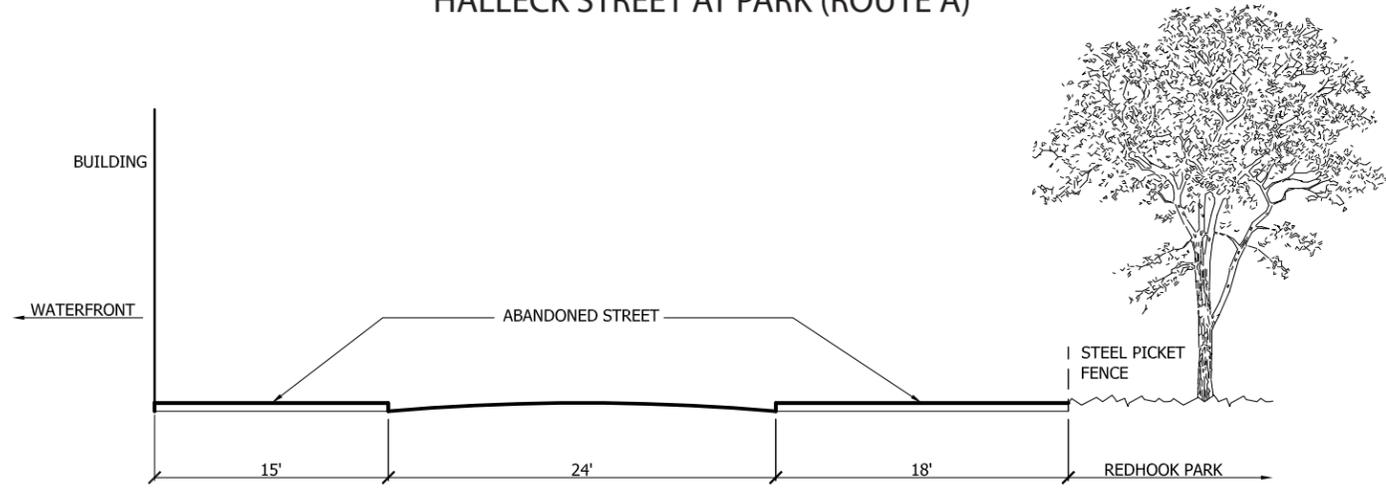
Existing configuration on Halleck Street between Court Street and Clinton Street
